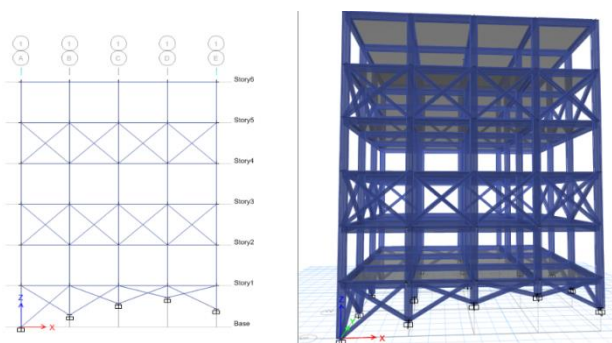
Typical plan and 3D view of Model-2 provided with vertical positioning of infill wall
